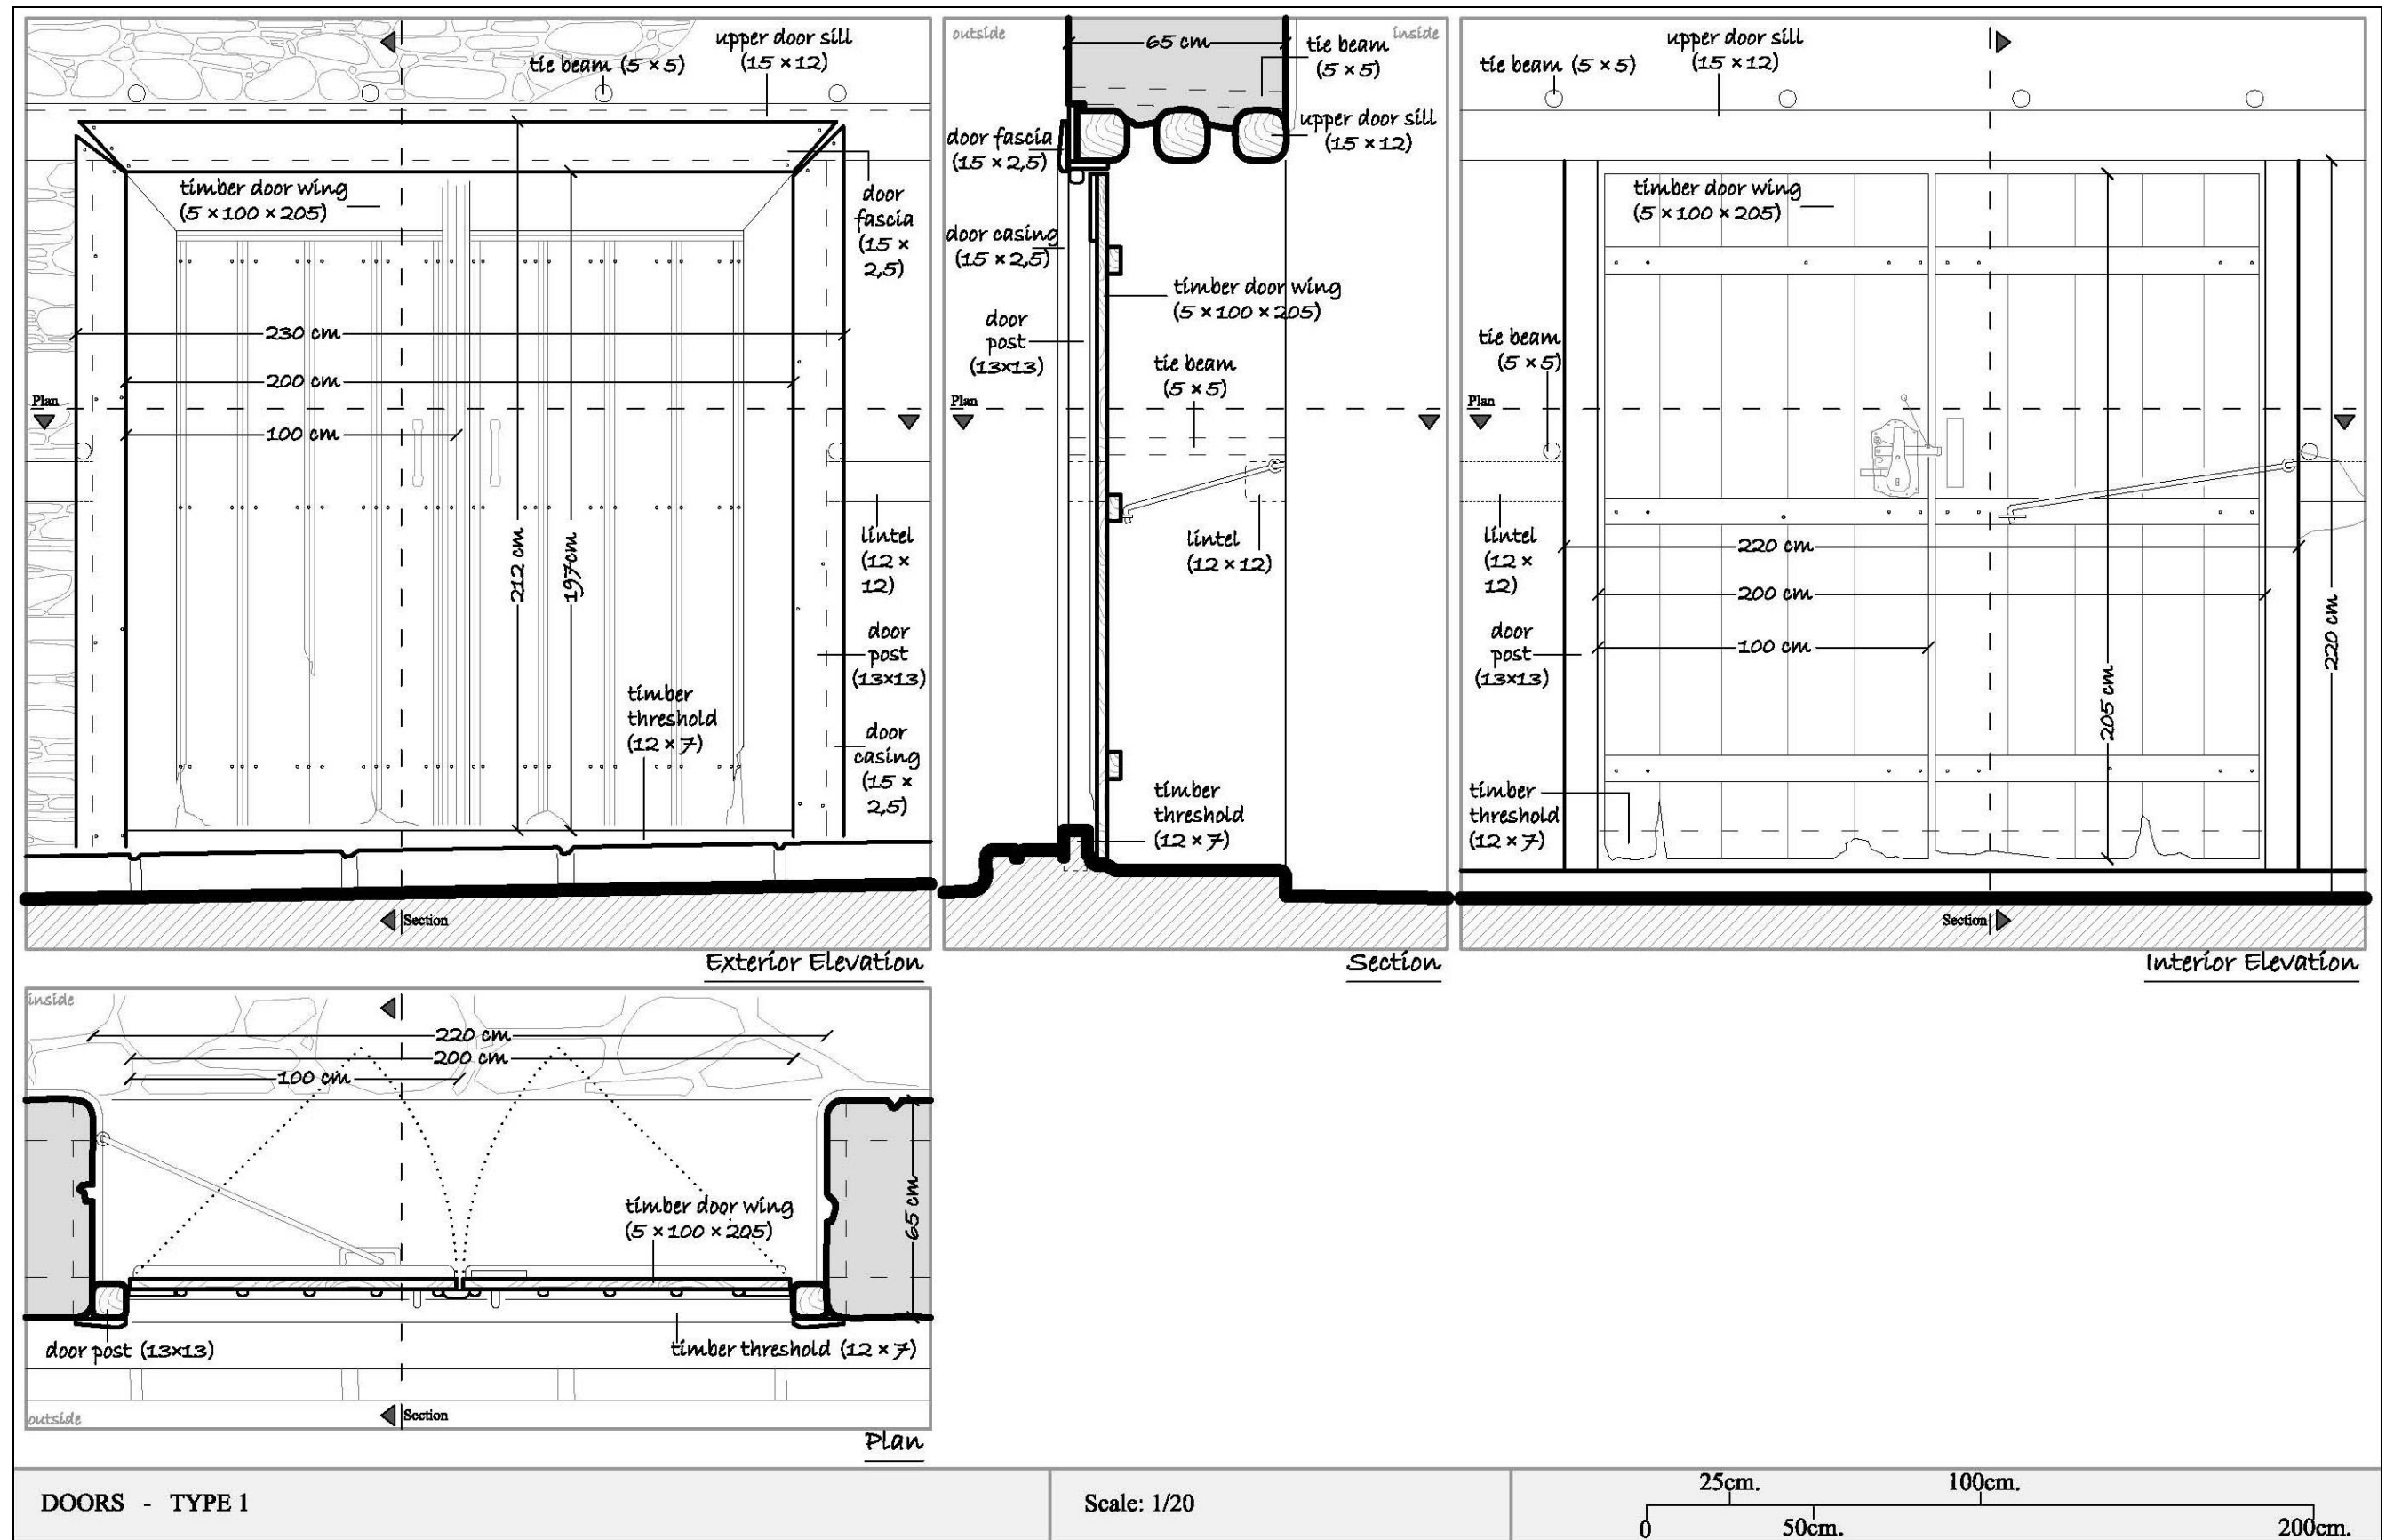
, Door openings Type 1 (Camikebir Quarter İmam Birgivi Street No:3)
